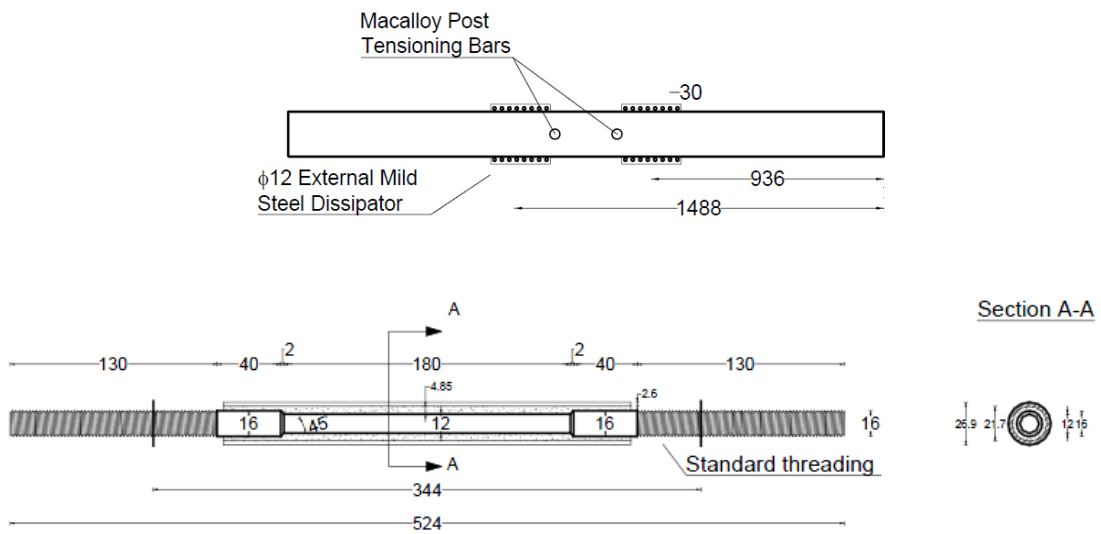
Post Tensioned Wall Section with $\phi 12$ External Mild Steel Dissipators
